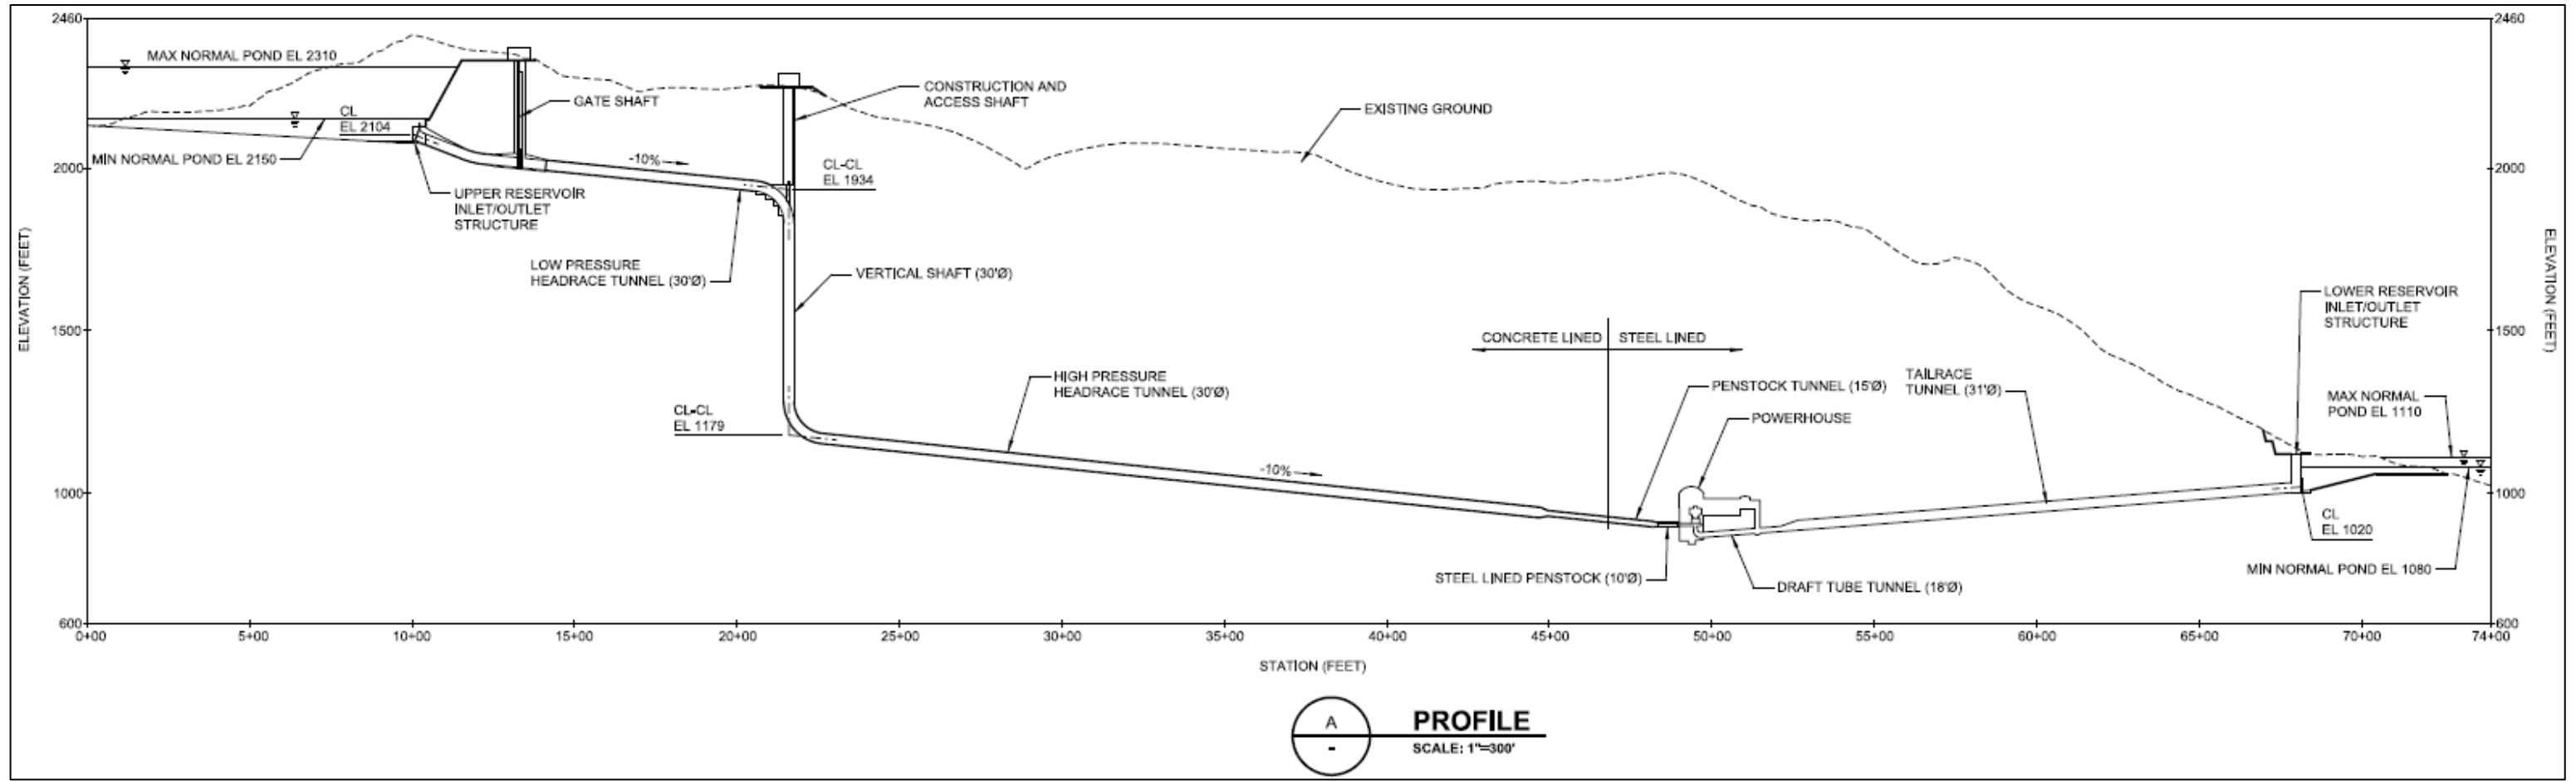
Bad Creek II Complex Proposed Facilities Cross-section
